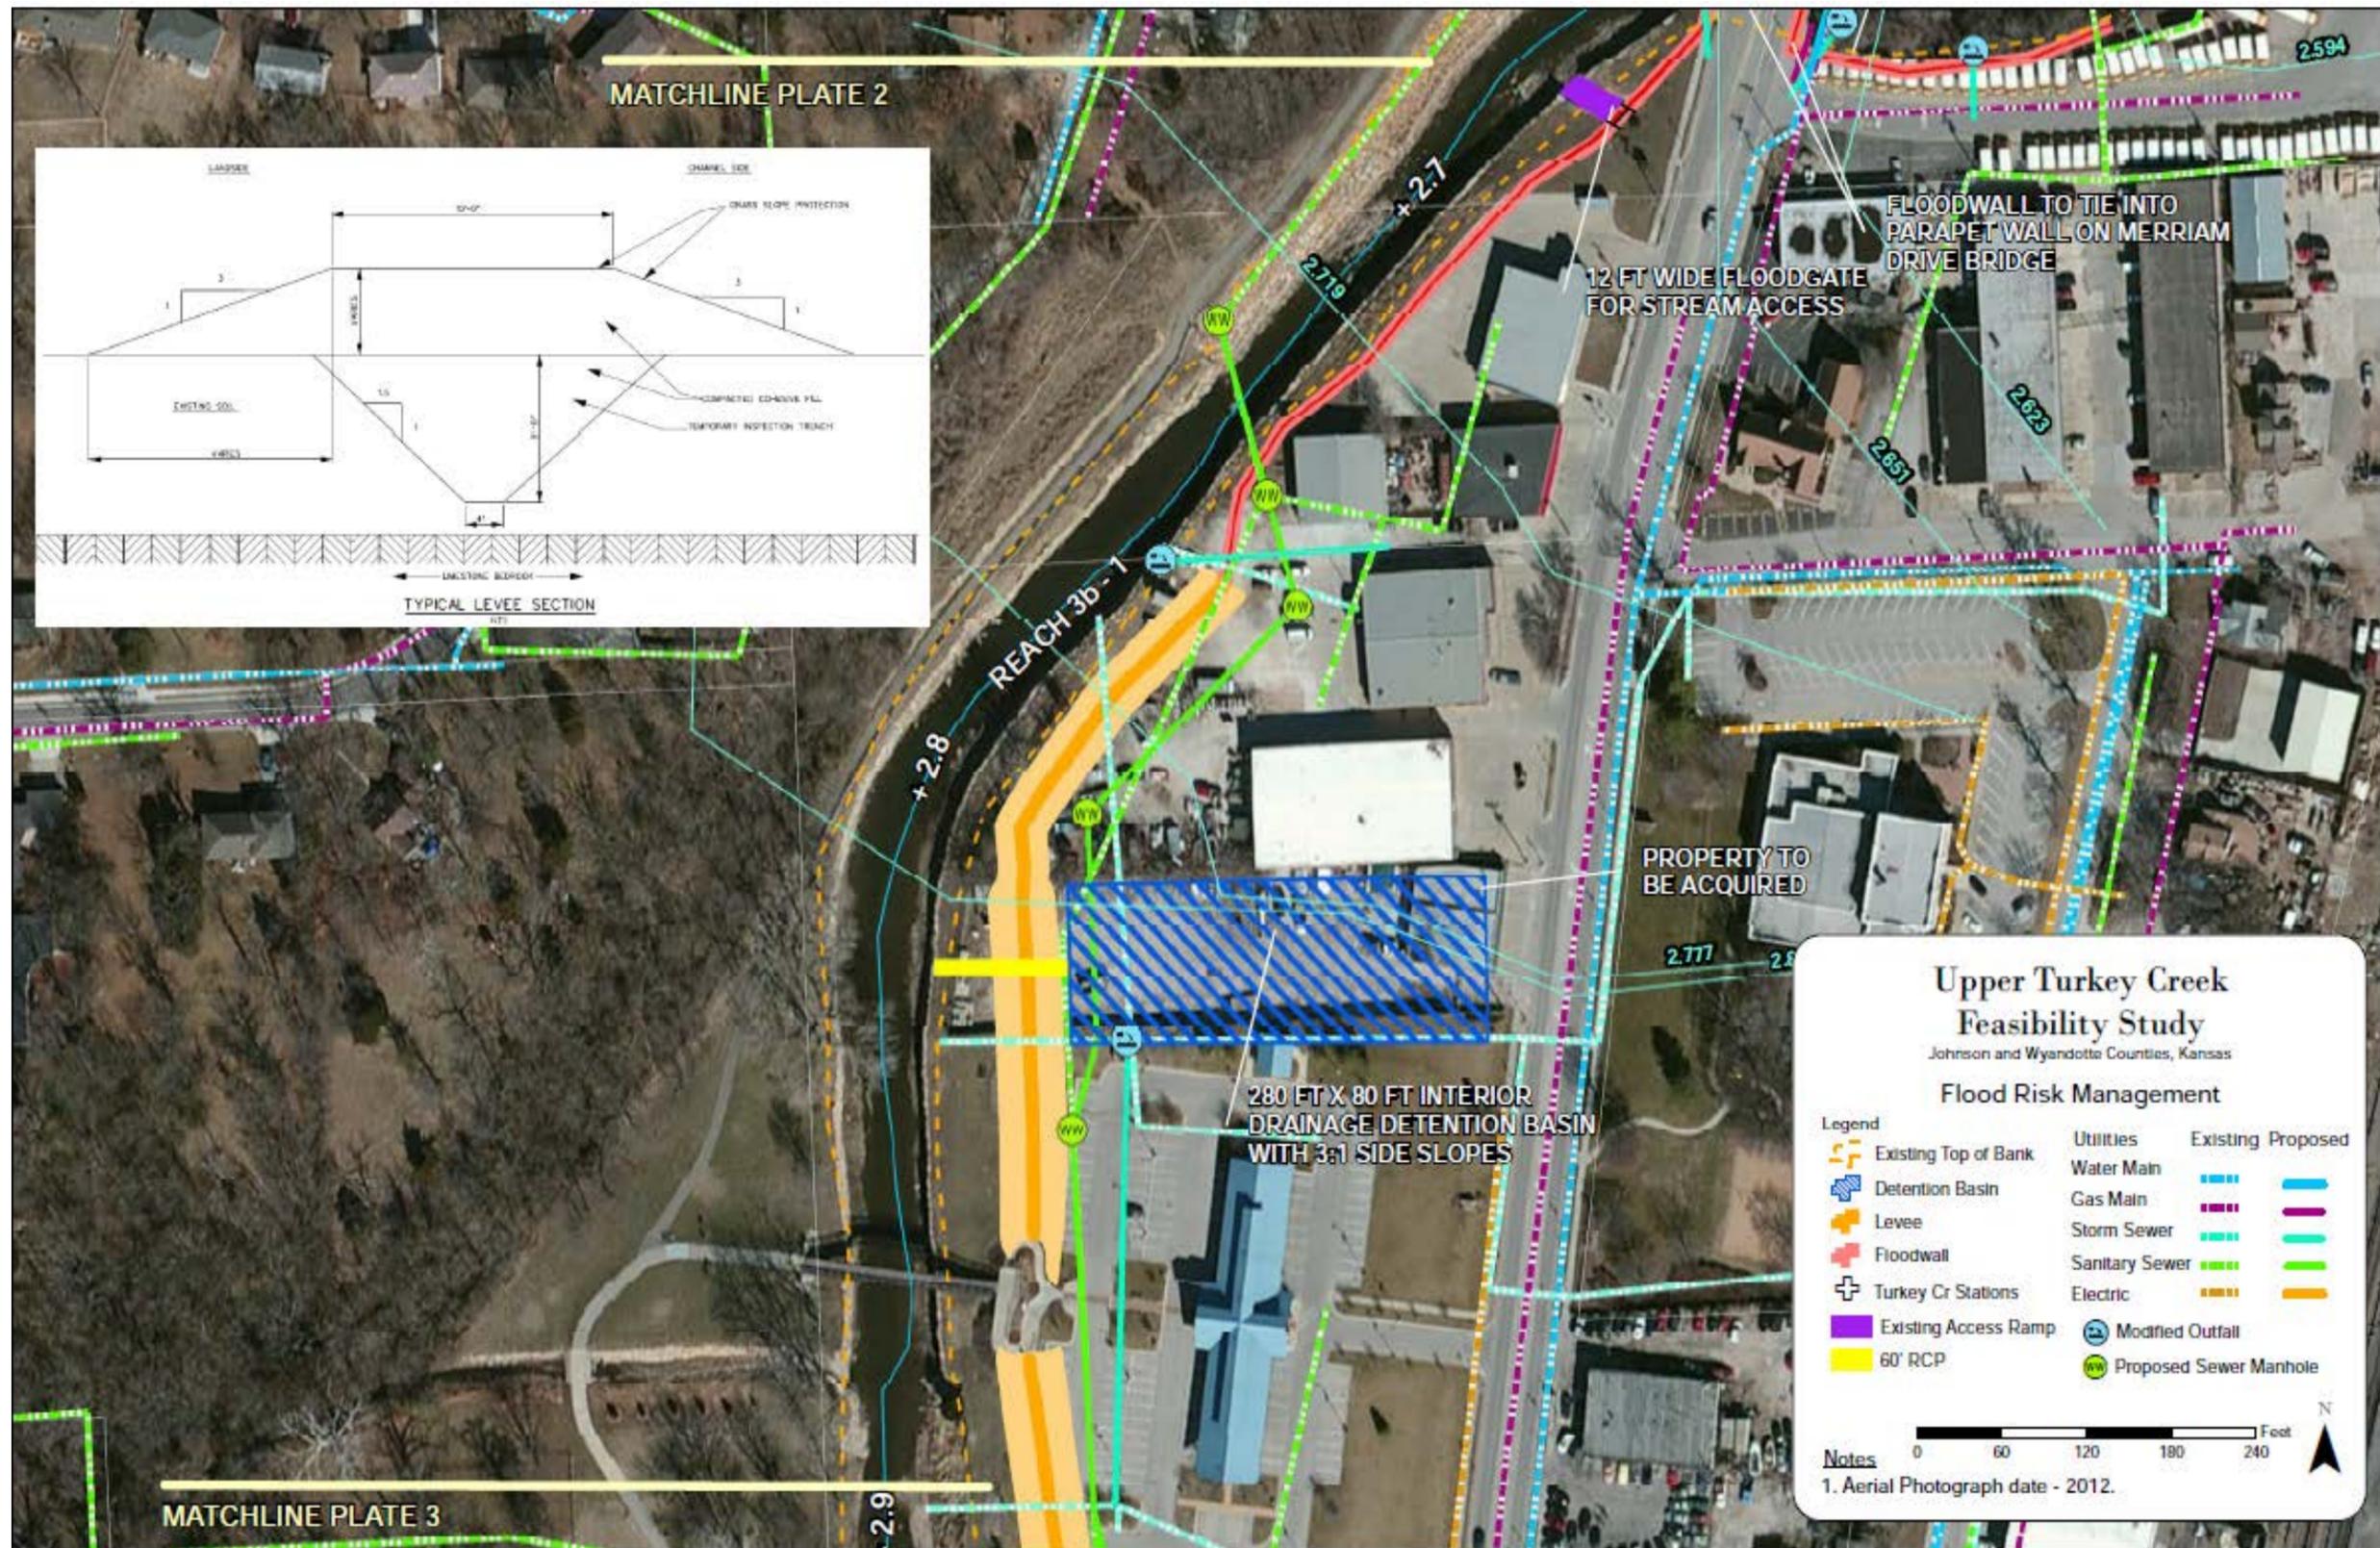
Recommended Plan (Alternative 2d) - Plate 2
